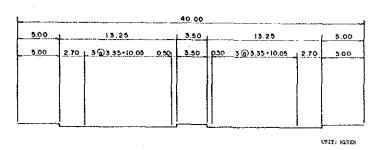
TYPICAL CROSS SECTION OF CORREDOR SUR (RIO MATAZNILLO- ATLAPA)
